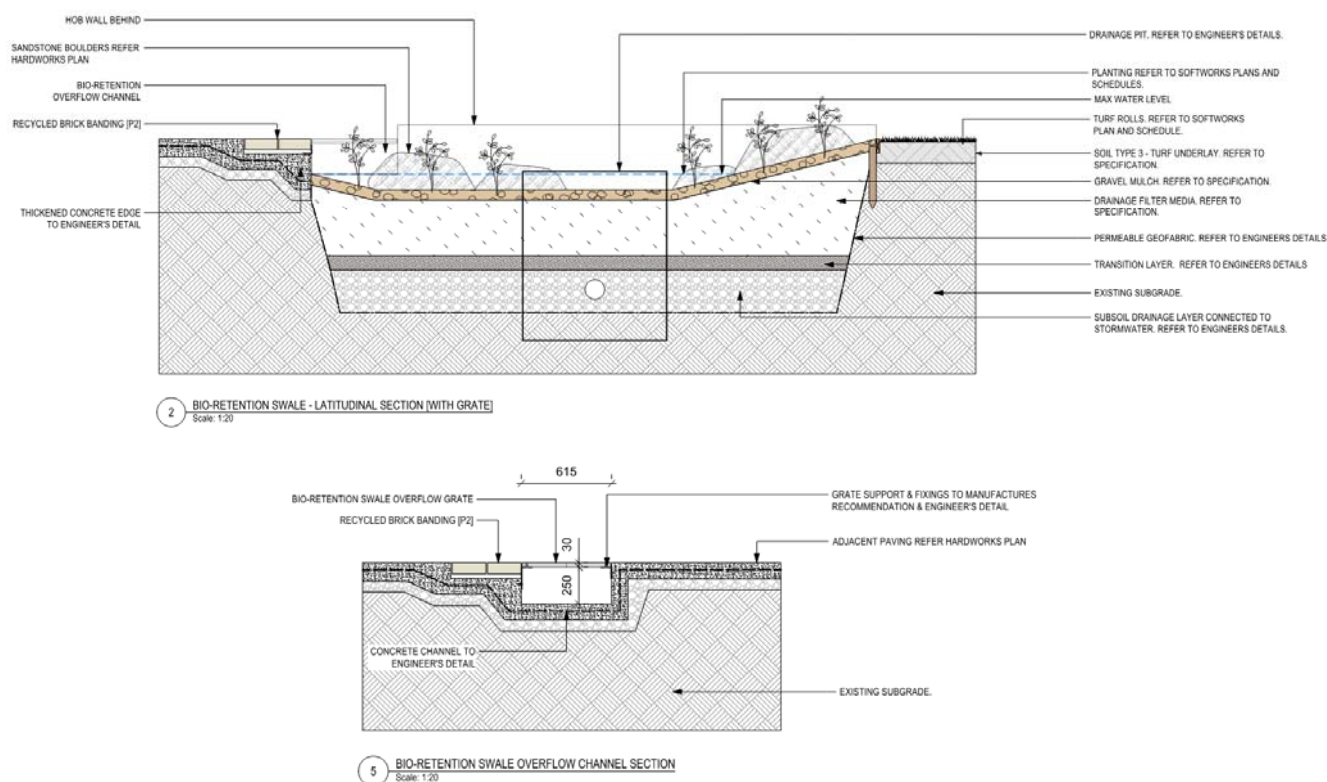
Bio-retention Swale and Overflow Drainage Slot details
